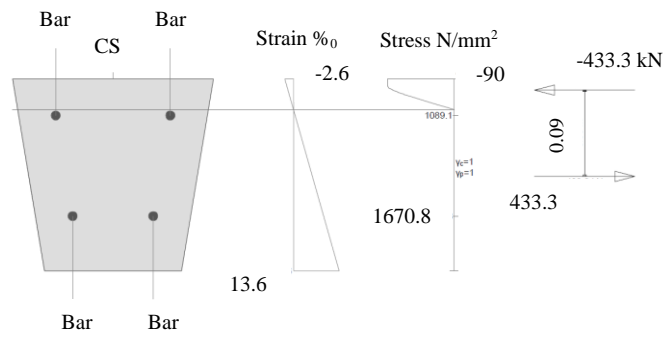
Cross-sectional strain-stresse on concrete and steel.
